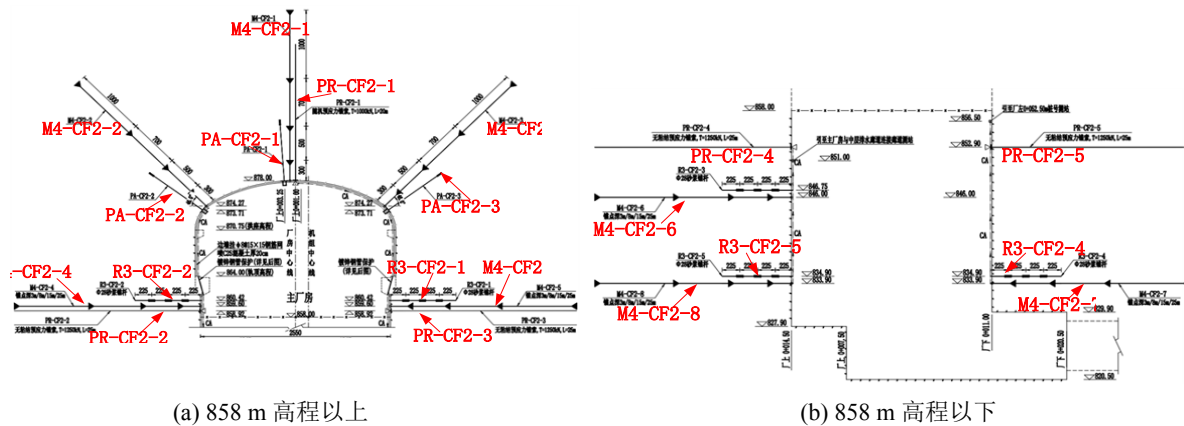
Plant A2-A2 profile monitoring facilities layout diagram
